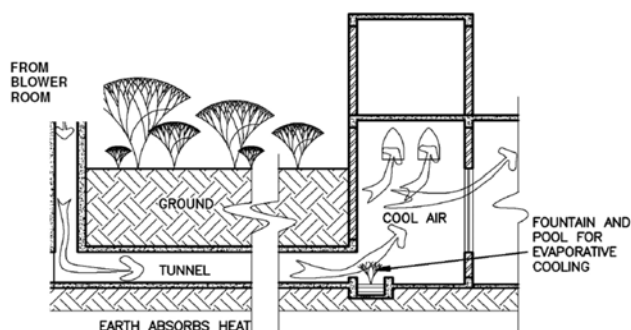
WORKING PRINCIPLE OF AN EARTH AIR TUNNEL
